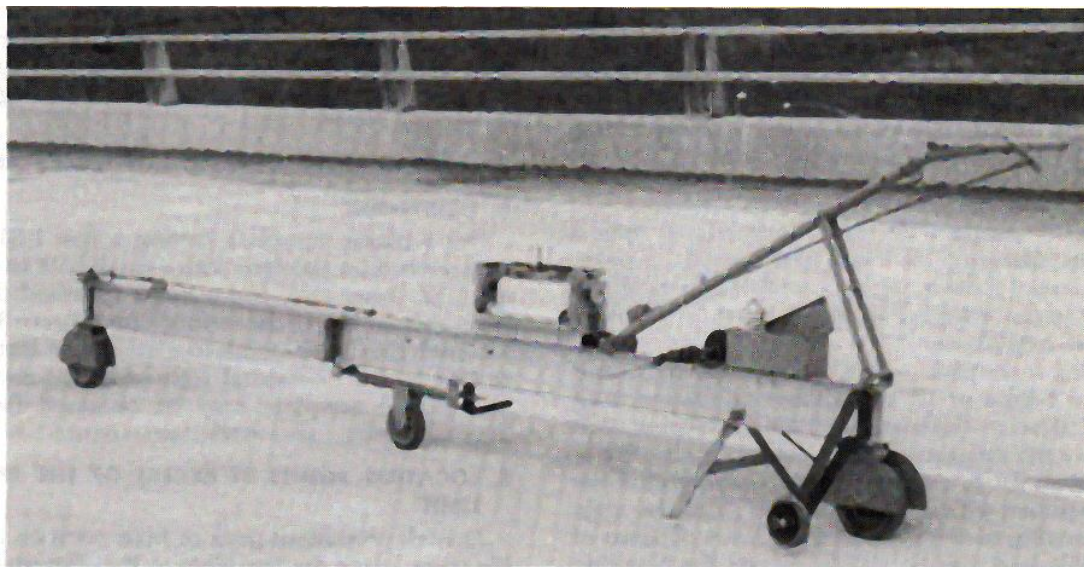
Rigid Beam Frame Bridge Profilograph
